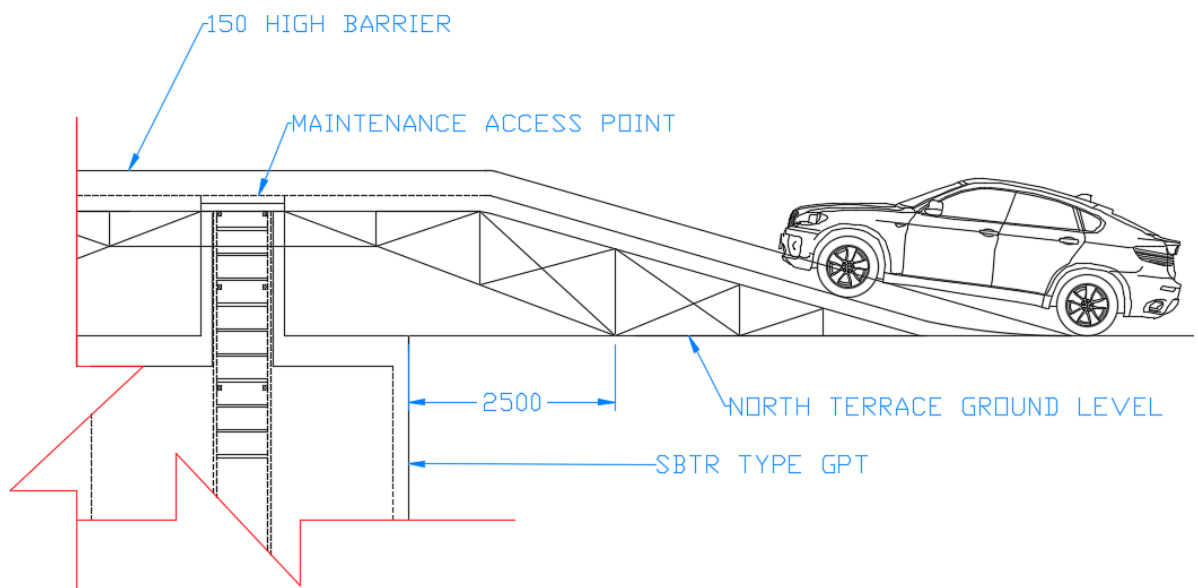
GPT Bypass Design Drawing (Hydro-Future Consulting, 2015)
